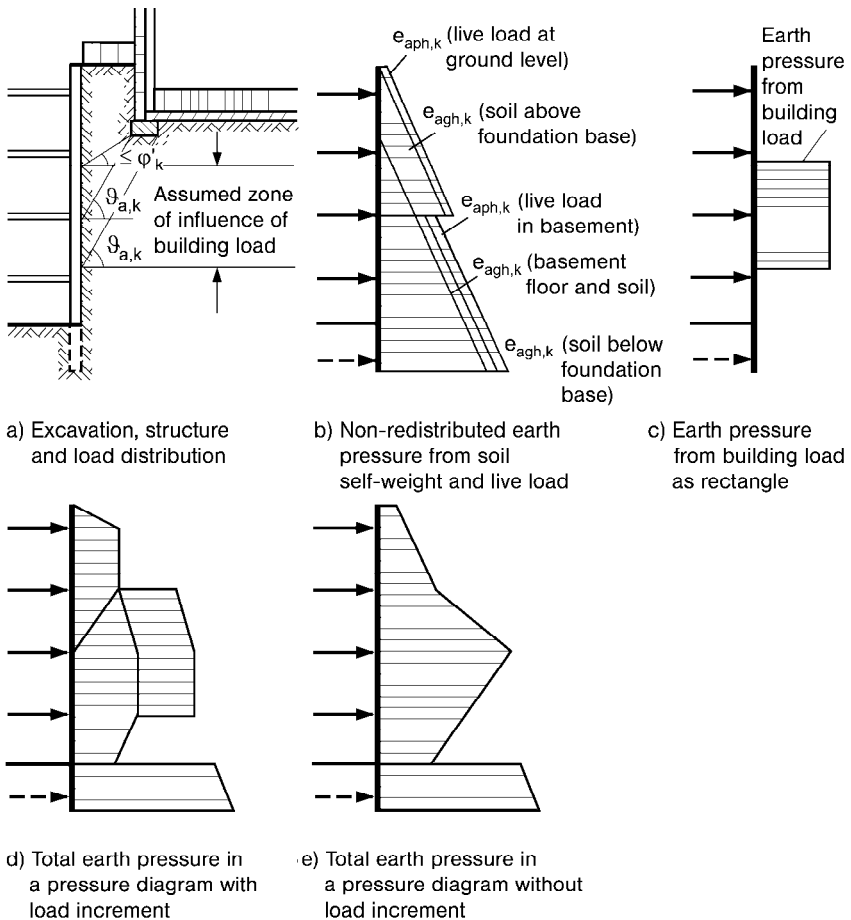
Distribution of active earth pressure taking into consideration the influence of a building load with small distance between retaining wall and structure (example for a sheet pile wall or in-situ concrete wall with free-earth support)
